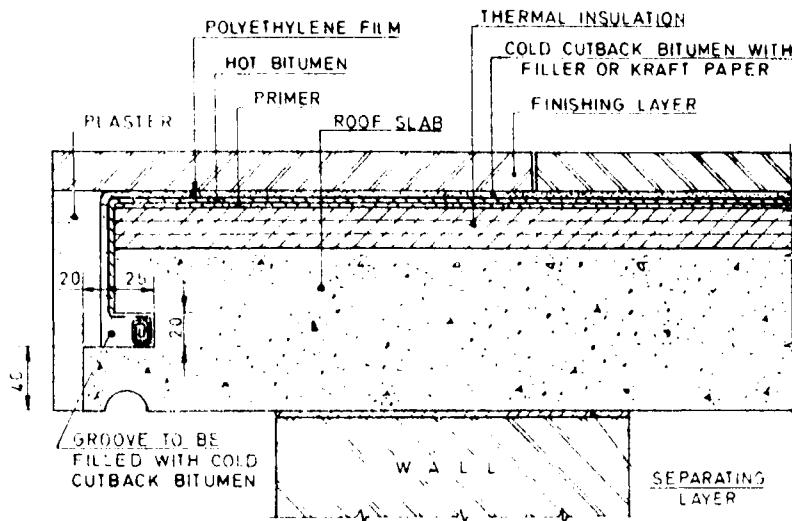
TYPICAL ARRANGEMENT FOR LAYING
